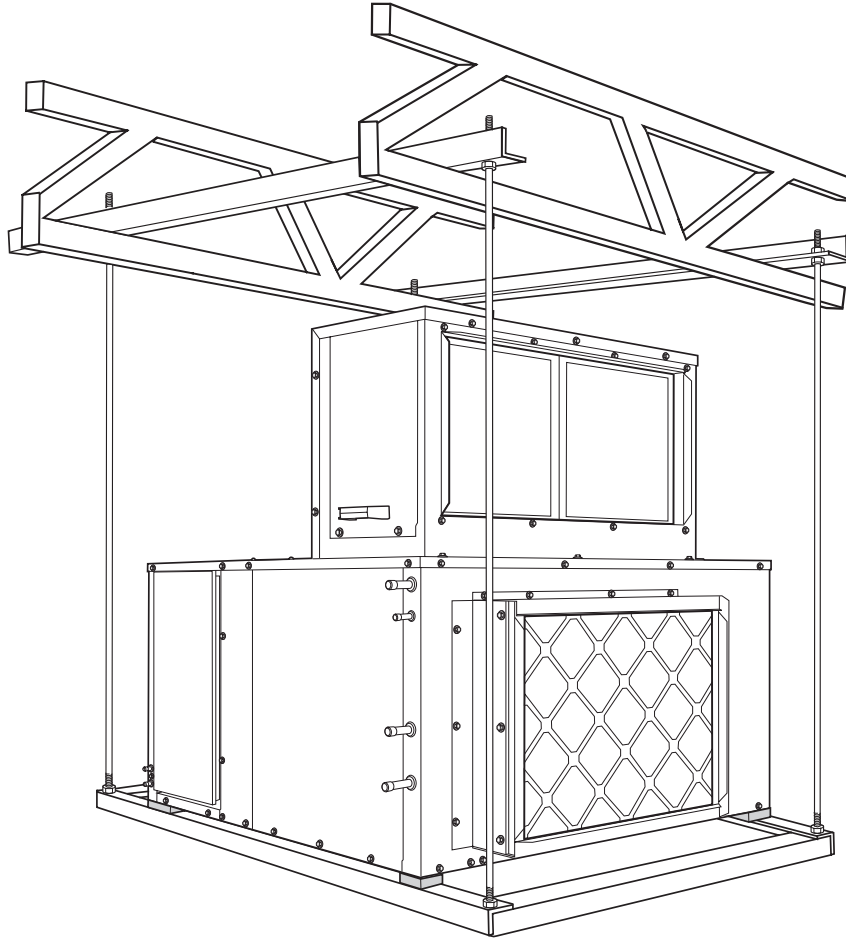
Typical Suspended Installation - LC Only (LV Units are floor units only)
